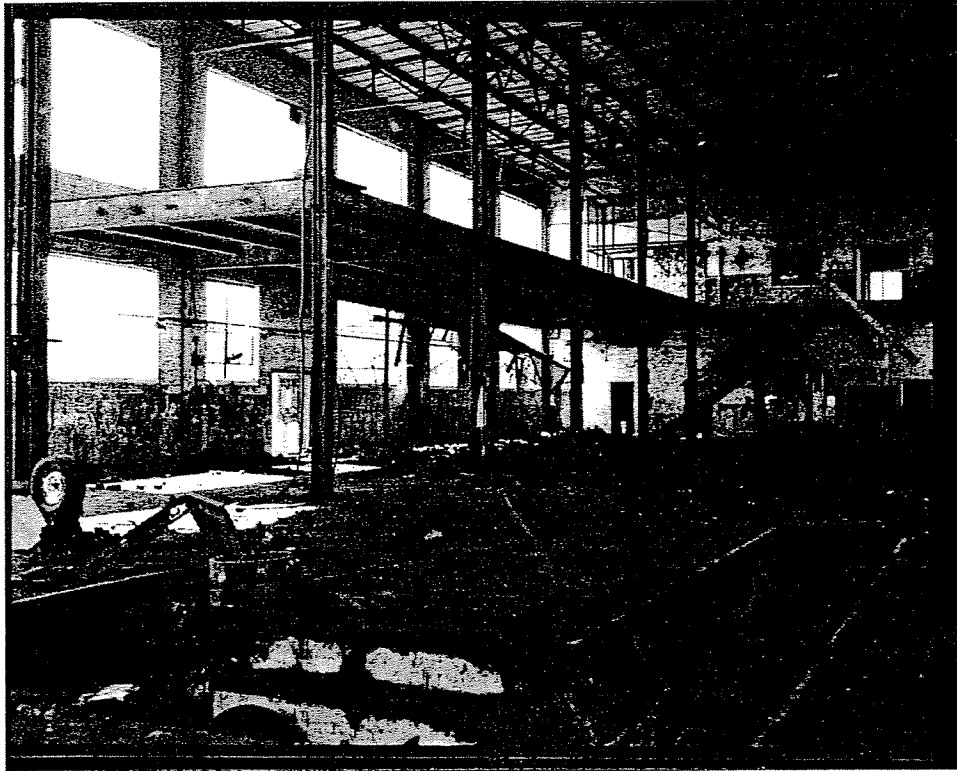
South and west elevations of Hanna Furnace Trestle Ramp, facing north-northeast. Hanna Furnace Redevelopment Project, Buffalo, Erie County, New York (PCI 2001).
